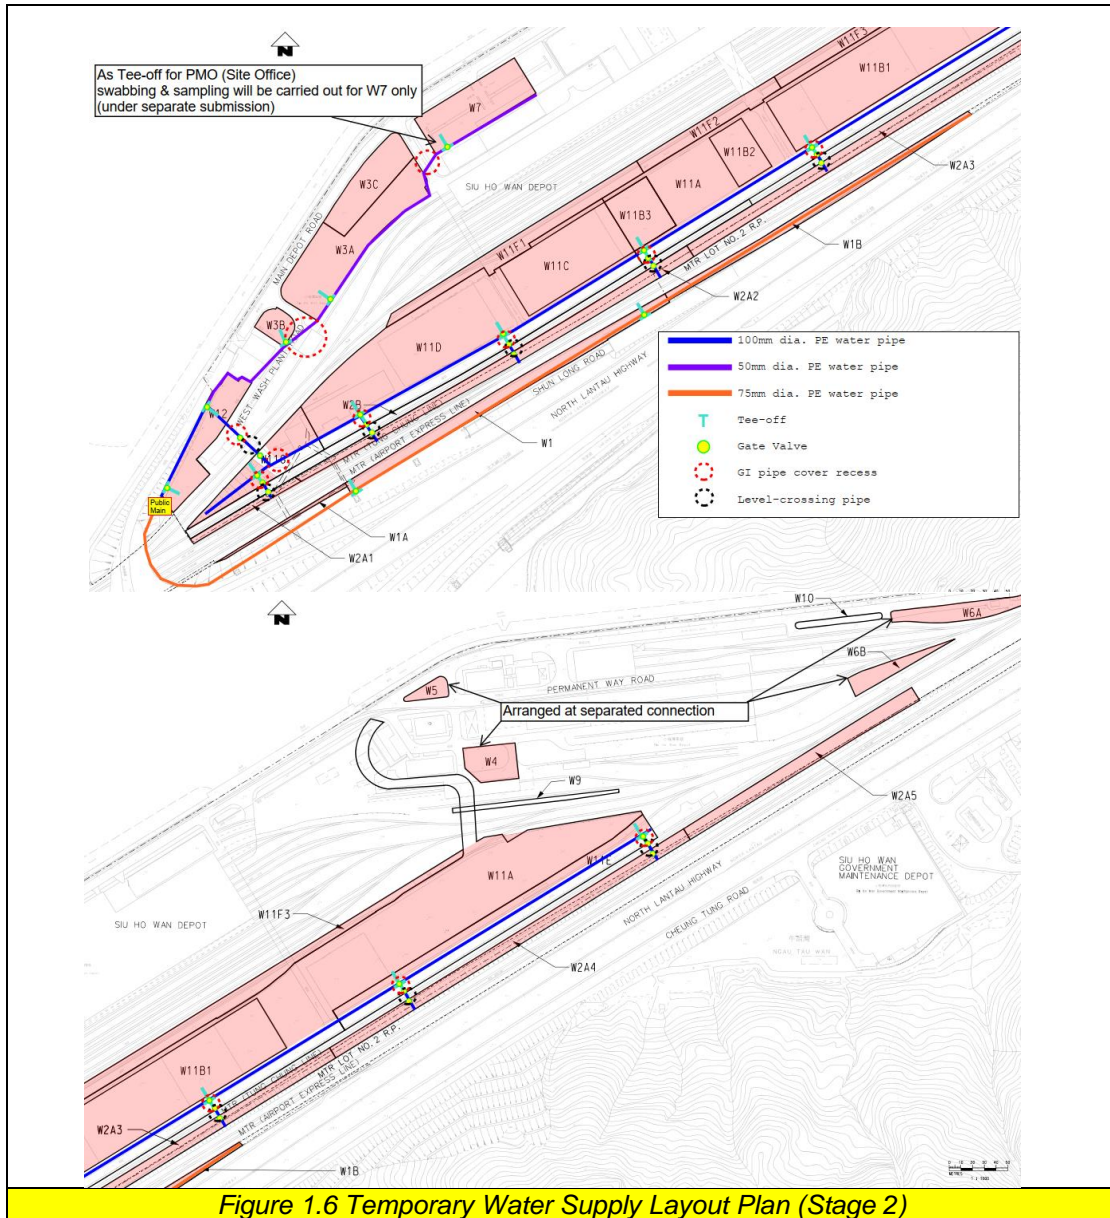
Temporary Water Supply Layout Plan (Stage 2)
